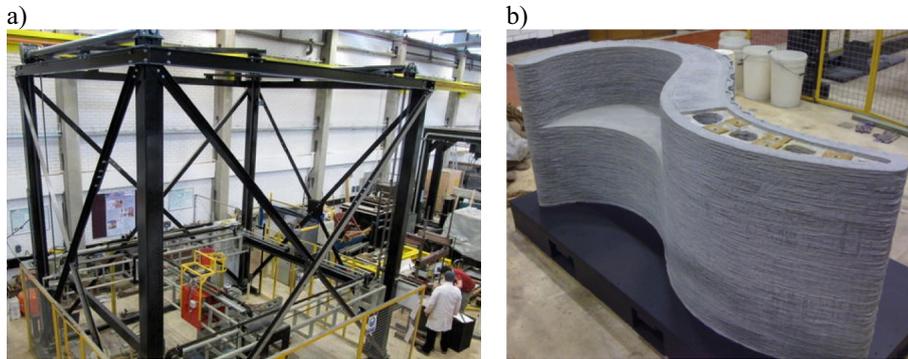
a) The printing frame of Concrete Printing [108], b) The printed Wonder Bench [98].
